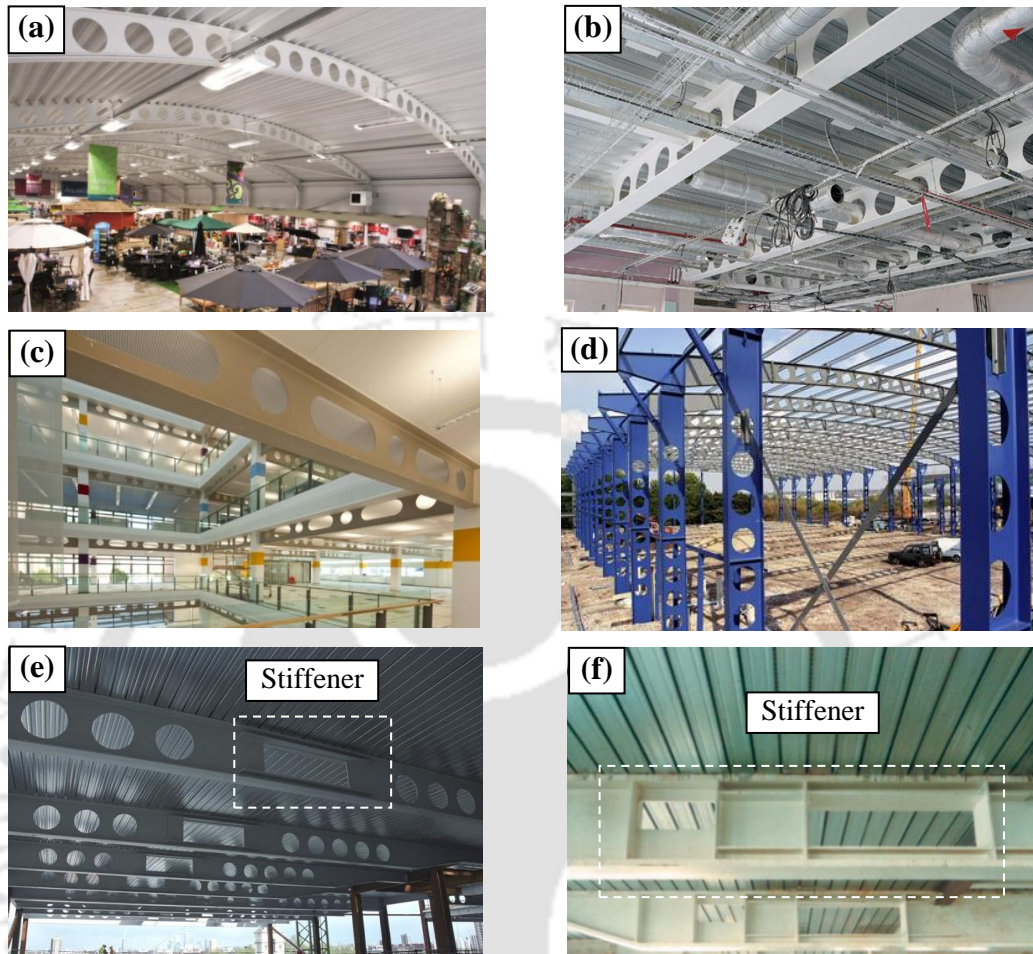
Structural members with perforation of varying configuration, without stiffeners (a-d) or with stiffeners (e, f) ([www.steelconstruction.info](http://www.steelconstruction.info))
